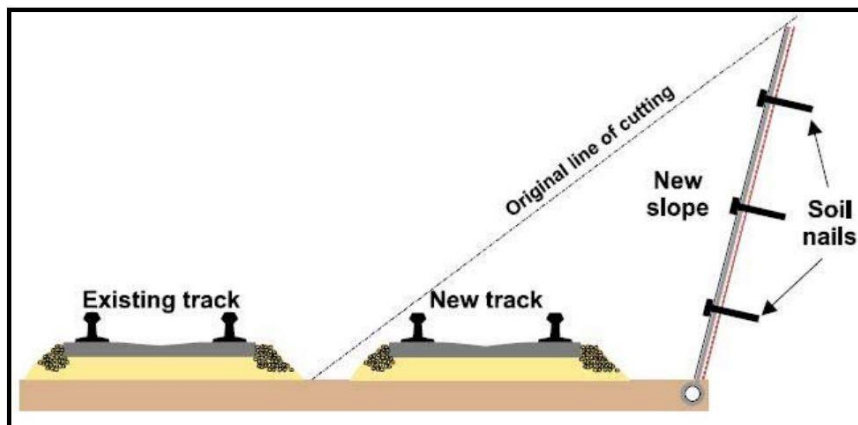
soil nailing in railway construction for laying new tracks adjoining 1.1 various types of soil nailing
